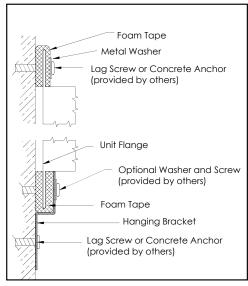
MOUNTING THE ERV TO A STUD WALL
